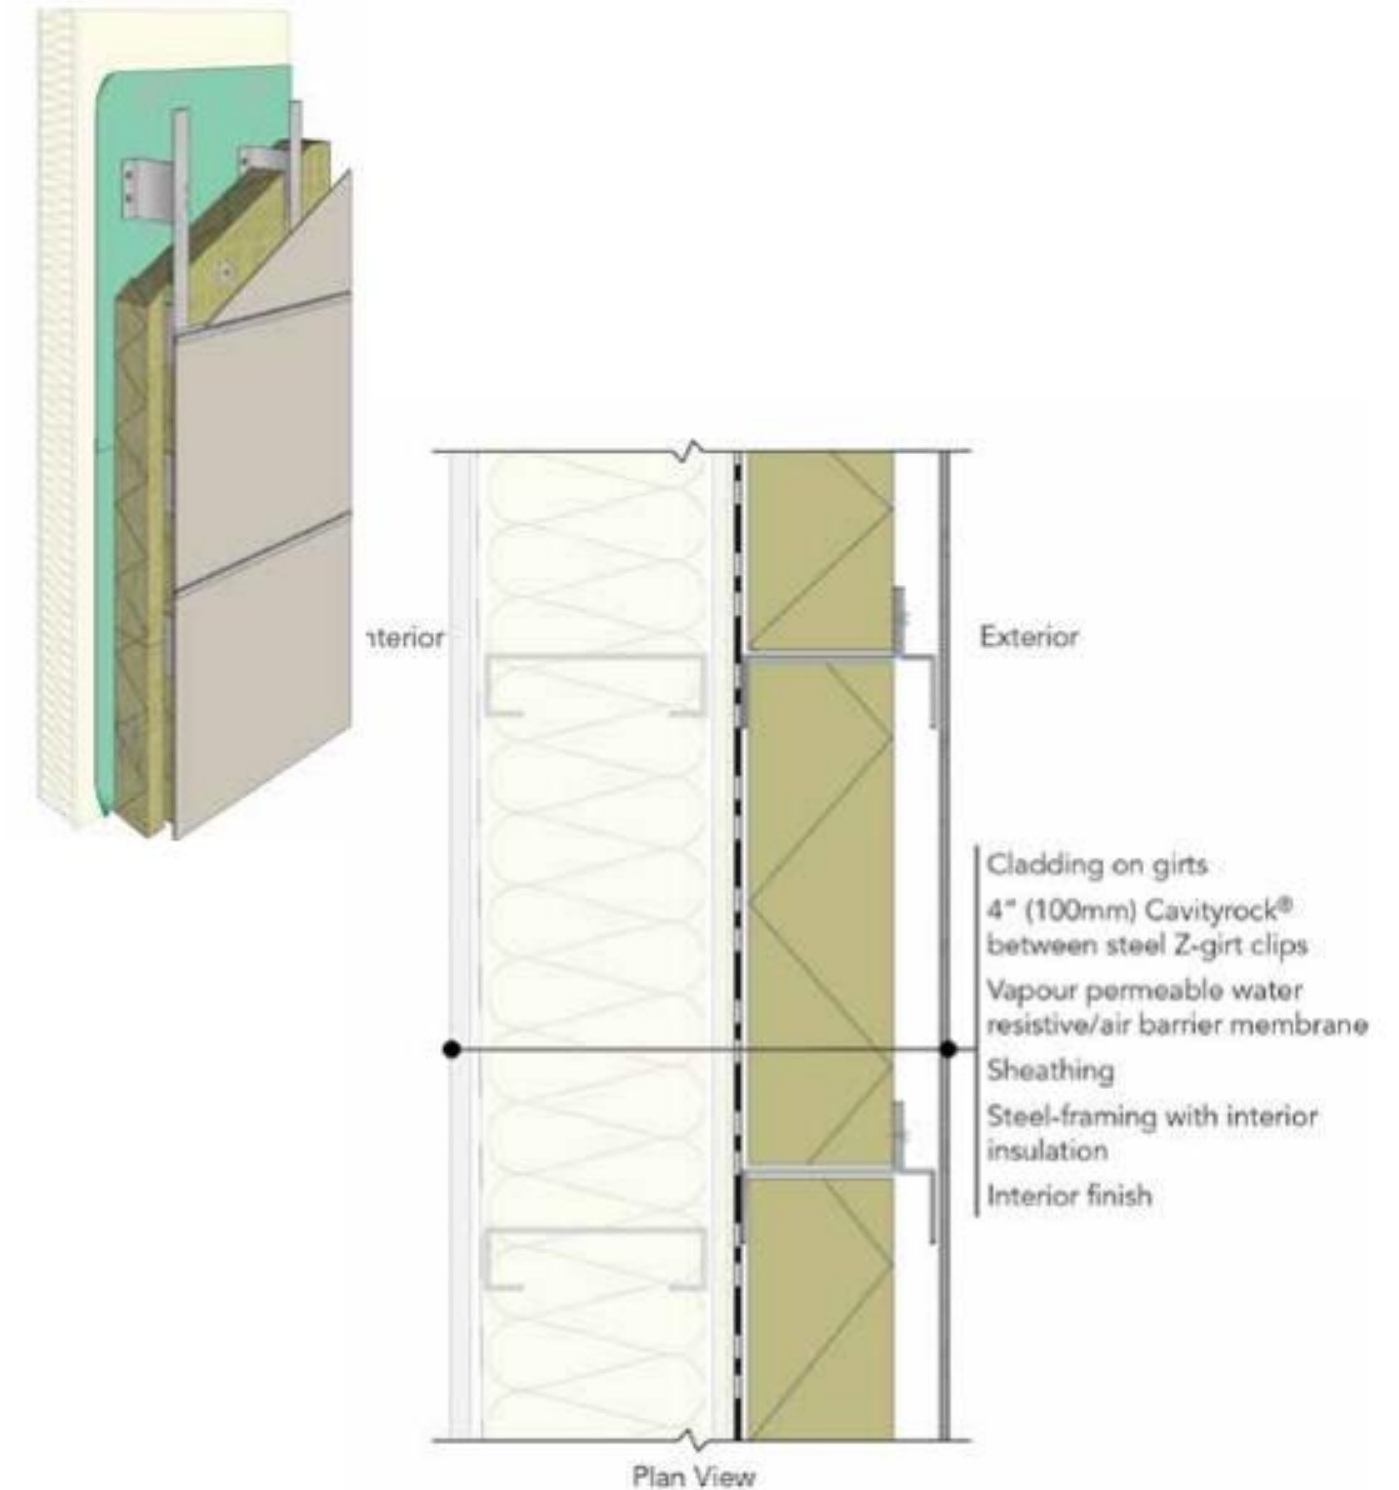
ROCKWOOL Cavityrock between a Z-girt clip system, installed over an existing steel stud wall
